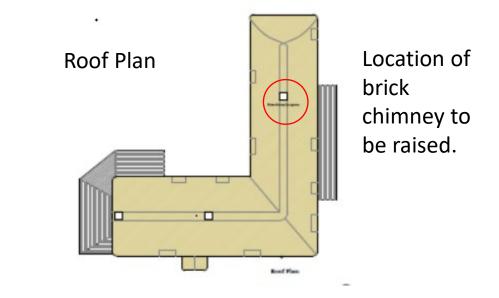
Image B: Existing brick chimney to be raised by approximately 3 x courses of bricks
